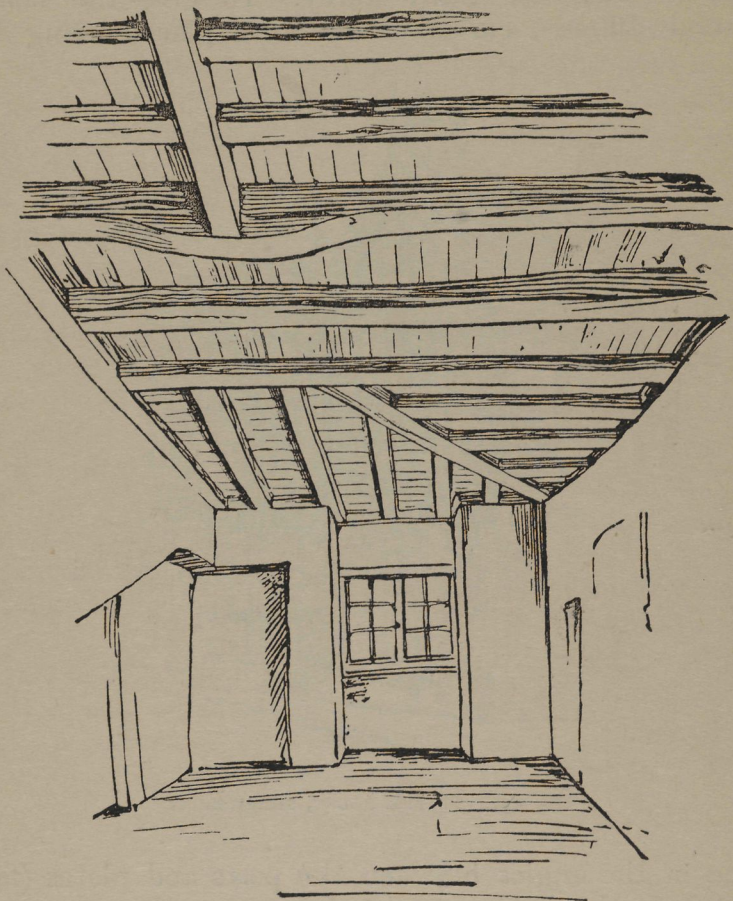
FRAMING OF THE FLOOR IN A CORNER HOUSE
